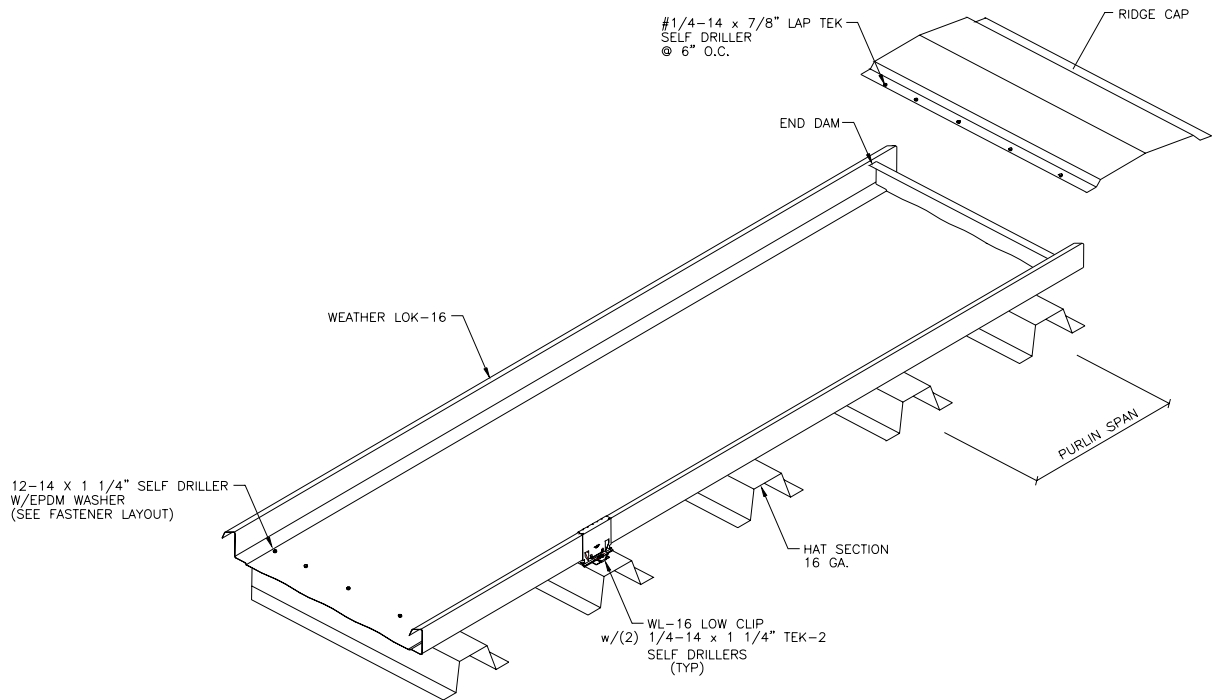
Weather Lok Panel Installation Over 16 Gauge (Hat) Purlins
